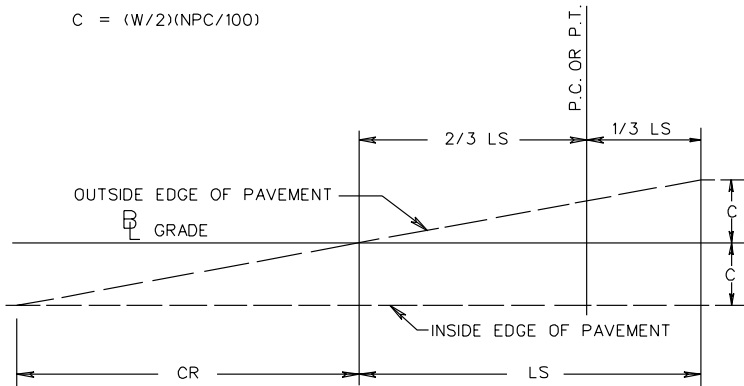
DETAILS FOR TRANSITIONED \bar{E} RURAL CONDITION WITH PAVEMENT WIDENING
